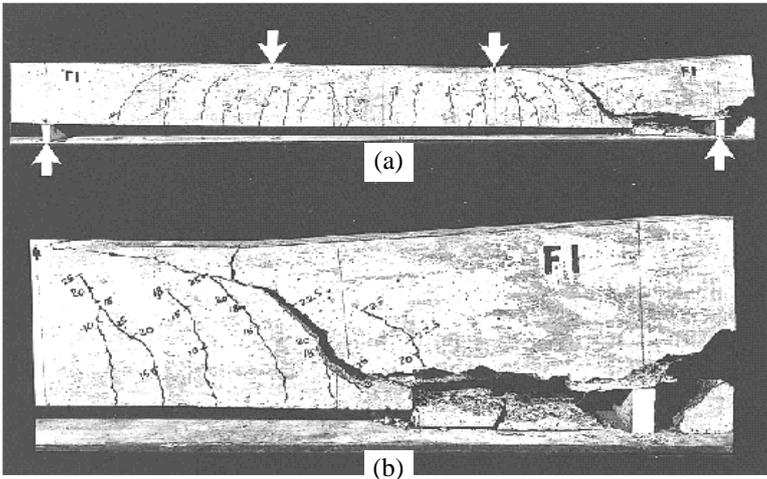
Shear Failure of concrete beam: (a) Overall View, (b) Detail near right support (Nilson)
